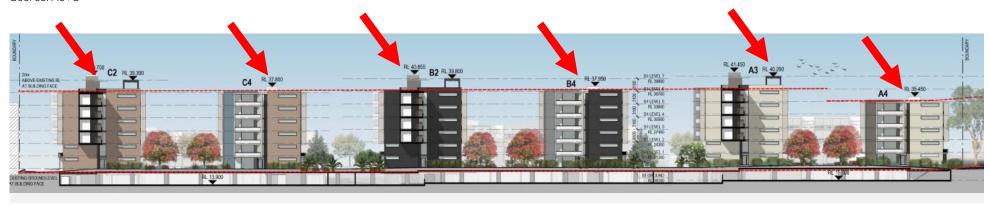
Northern elevation of Buildings A2, A4, B2, B4. C2, C4
